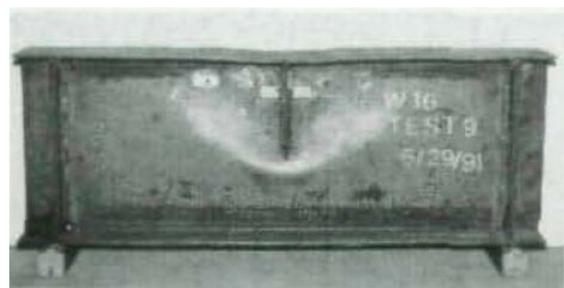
Failure mode 1—web crippling below stiffeners (test 9).
